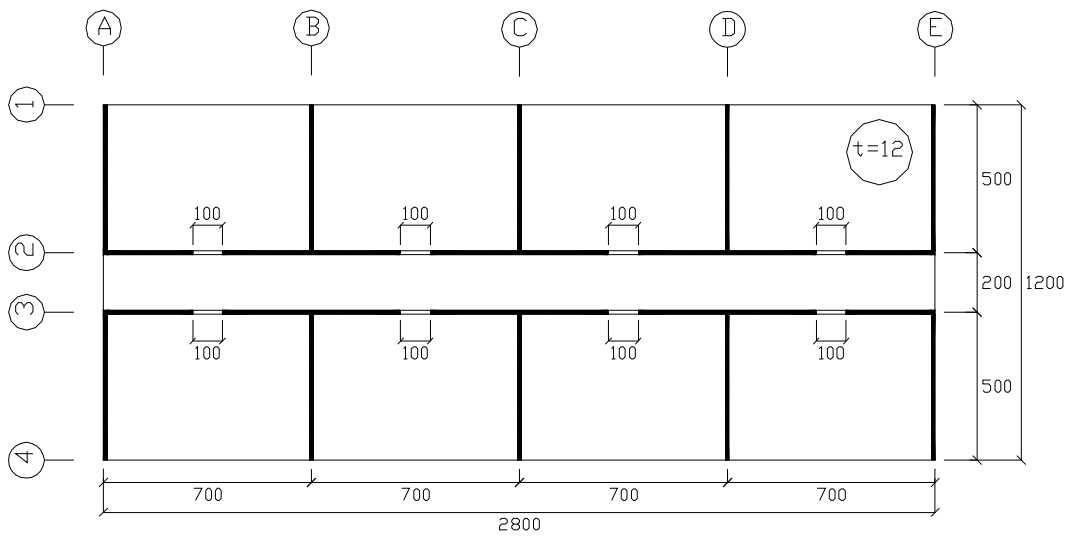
Typical plan view – Plan No. 14 (units in cm)
